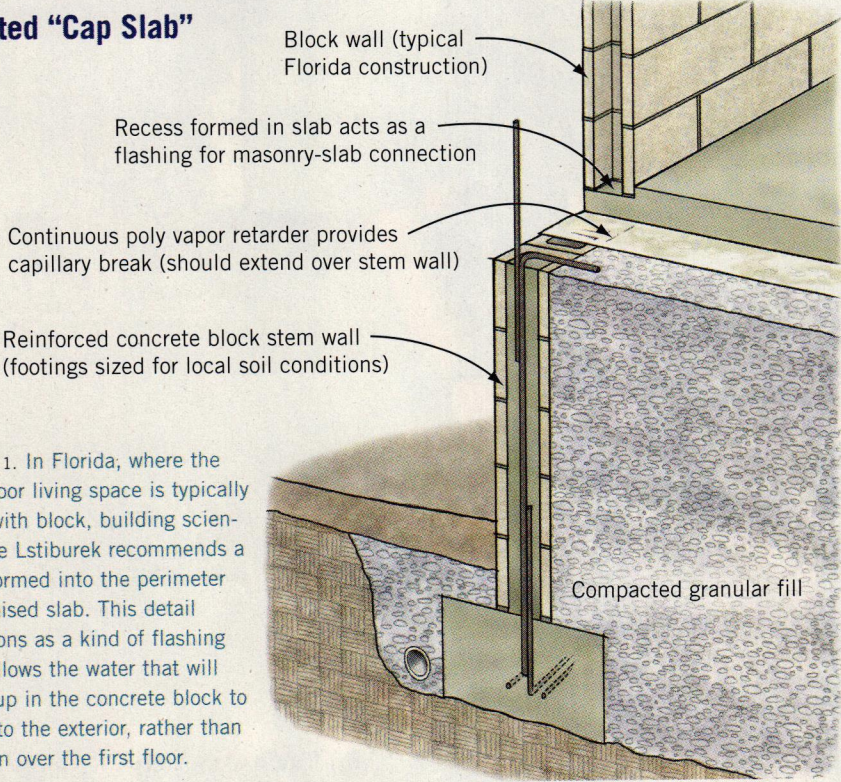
In Florida, where the first-floor living space is typically built with block, building scientist Joe Lstiburek recommends a seat formed into the perimeter of a raised slab. This detail functions as a kind of flashing that allows the water that will store up in the concrete block to drain to the exterior, rather than seep in over the first floor.
